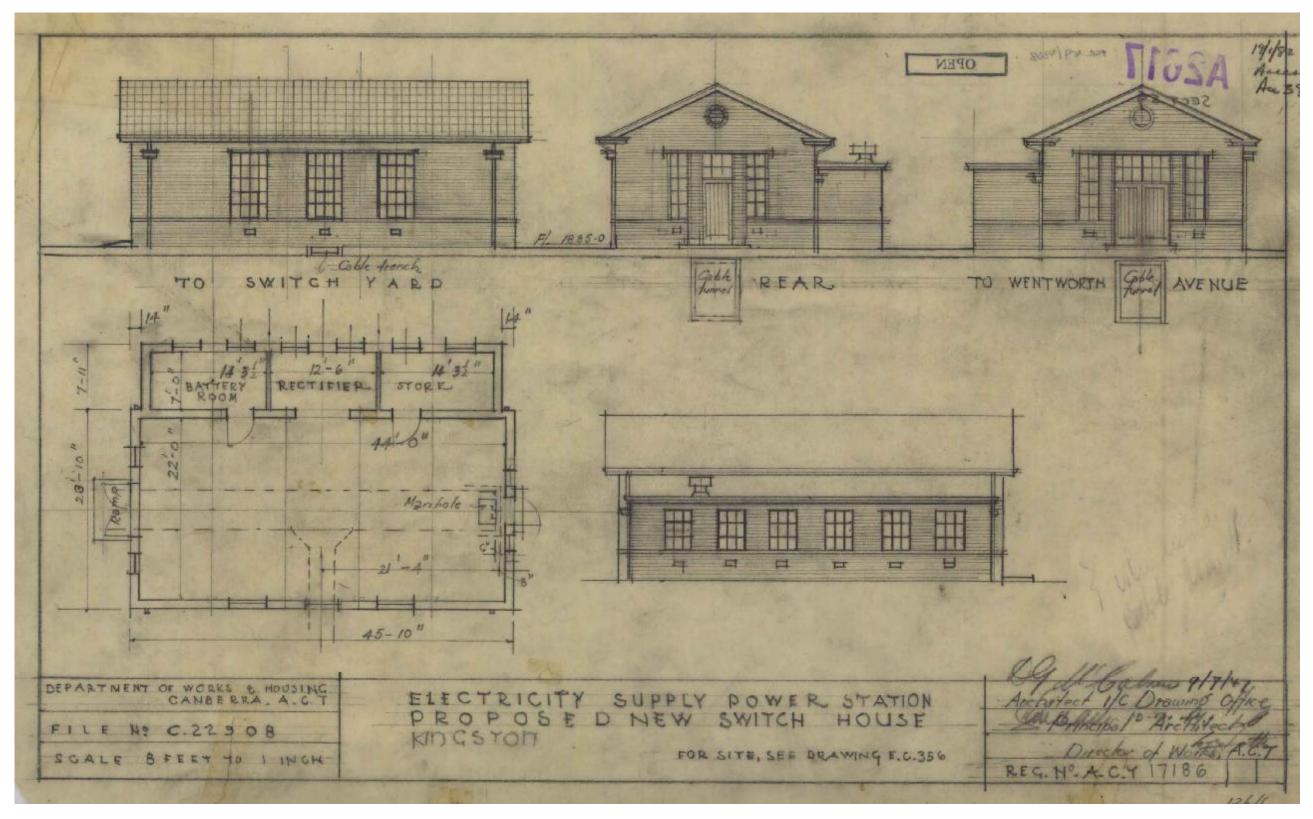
'Electricity Supply Power Station, Proposed New Switch House, Kingston,' prepared by the Director of Works, ACT, 9 July 1947. Source: National Archives of Australia.
